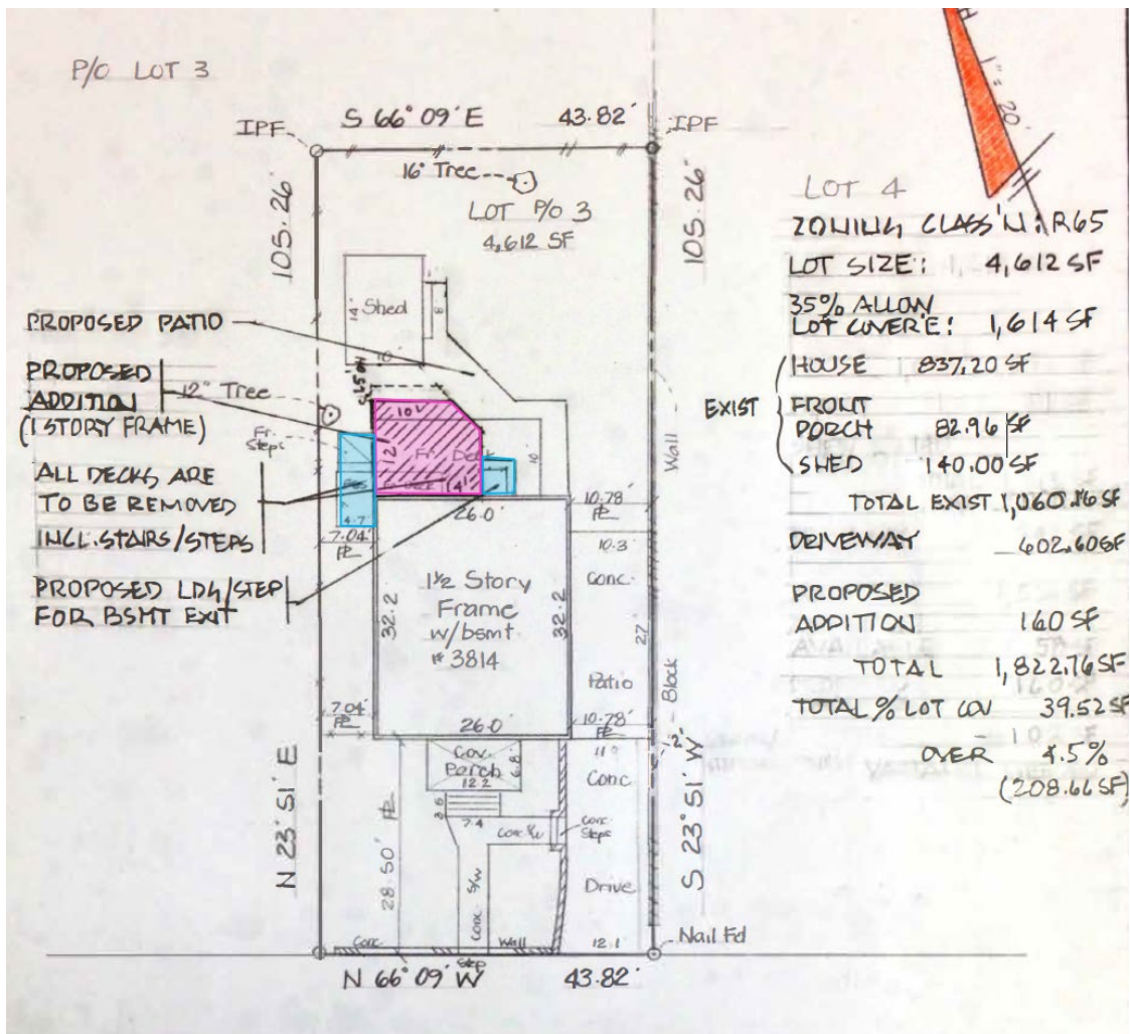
Proposed addition at 3812 Nicholson Street, Hyattsville
